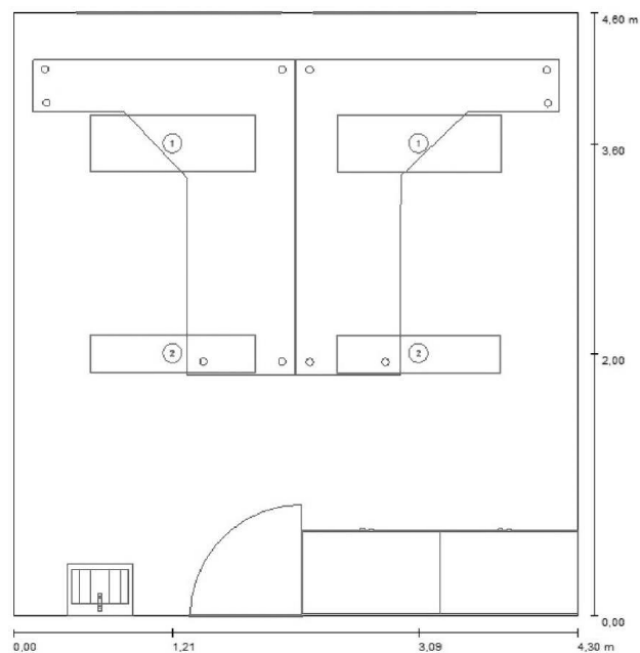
Layout of the office rooms showing the positions of the four luminaires. [44]
